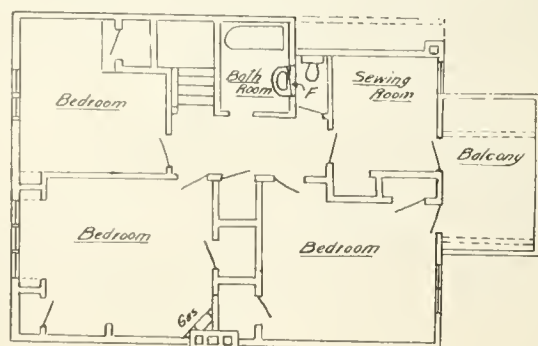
Bedroom floor plan of house shown in Fig. 1.
